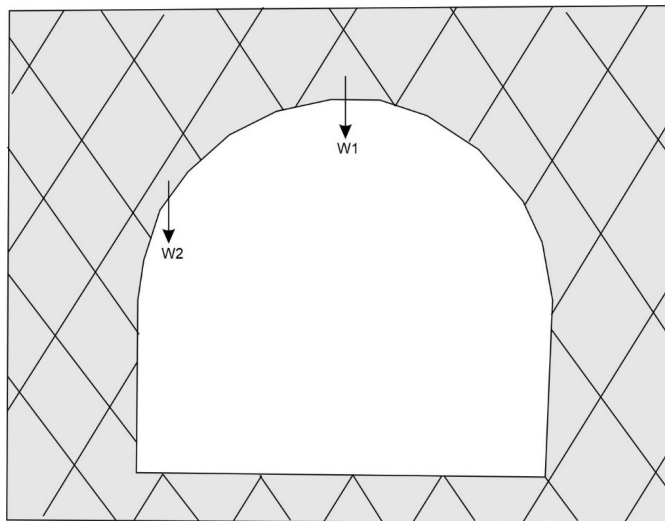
Potential scenario of block falls in tunnels located at shallow overburden.
